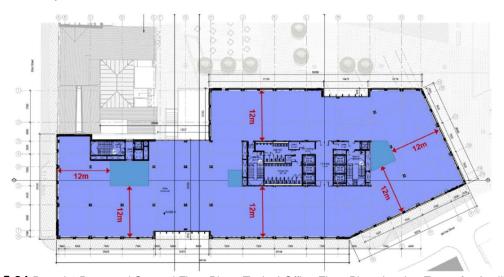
Parcel 1 Proposed Second Floor Plan. Typical Office Floor Plan showing Zones for Ancillary Use.
